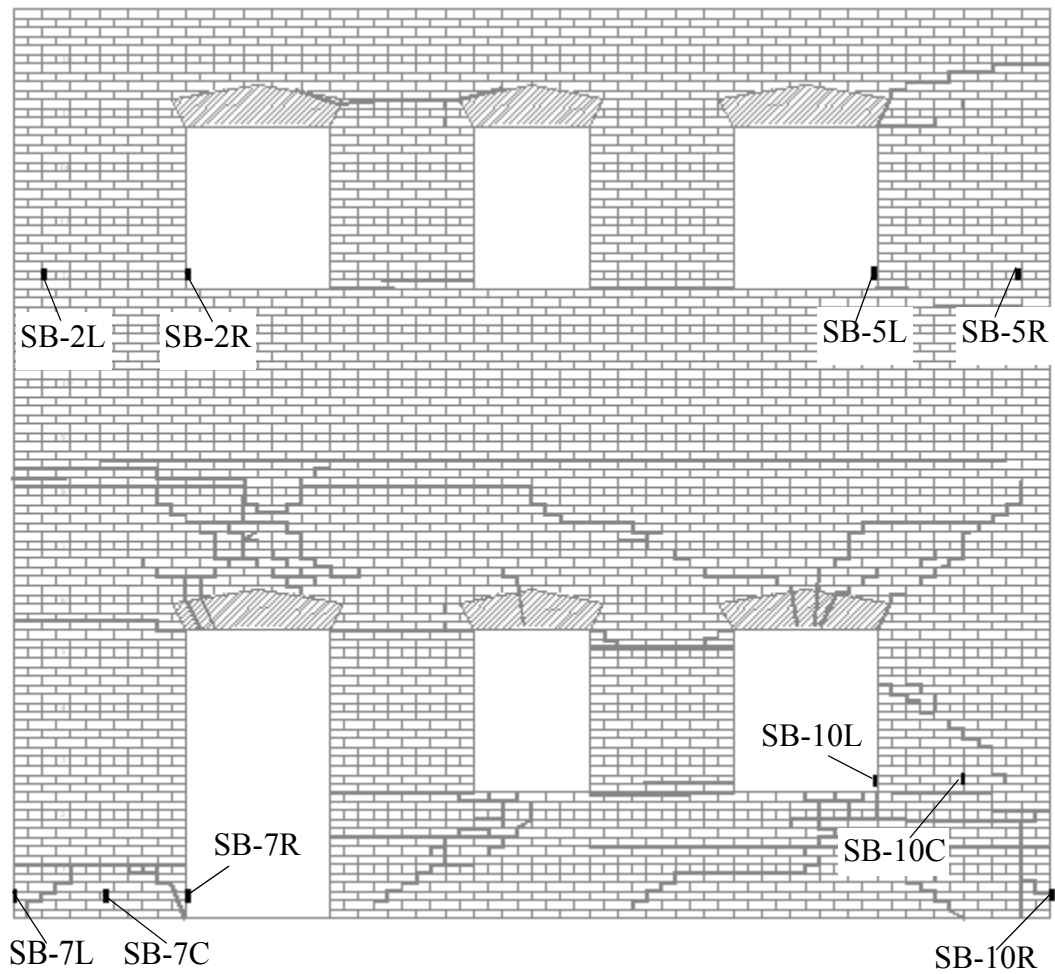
Elevation of Wall B illustrating the location of strain gages.
